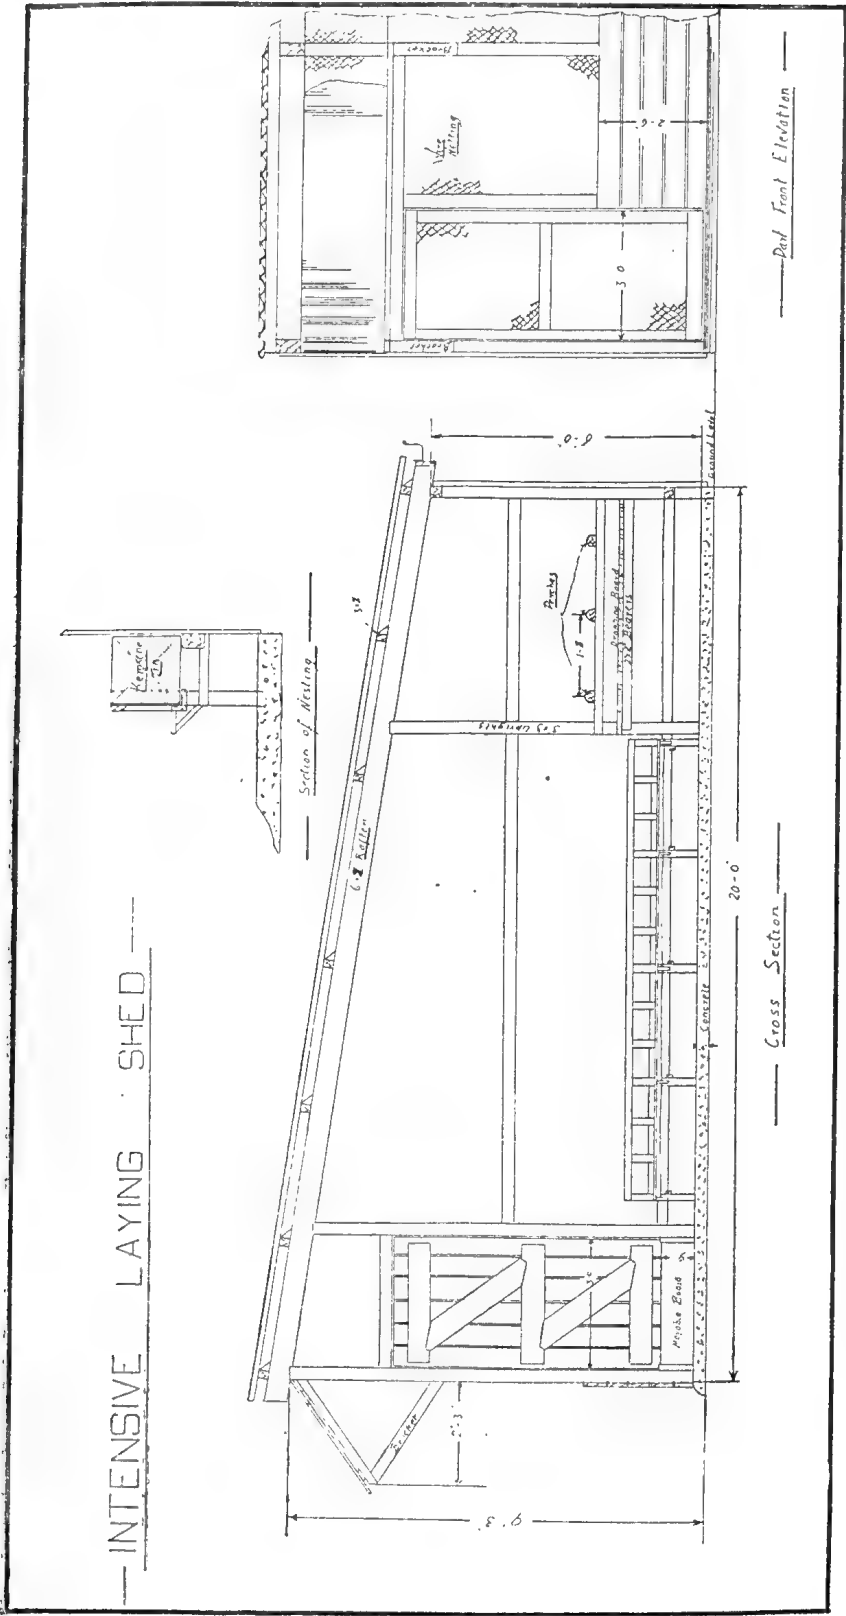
SHOWING END SECTION AND PART FRONT ELEVATION OF INTENSIVE LAYING SHED.
